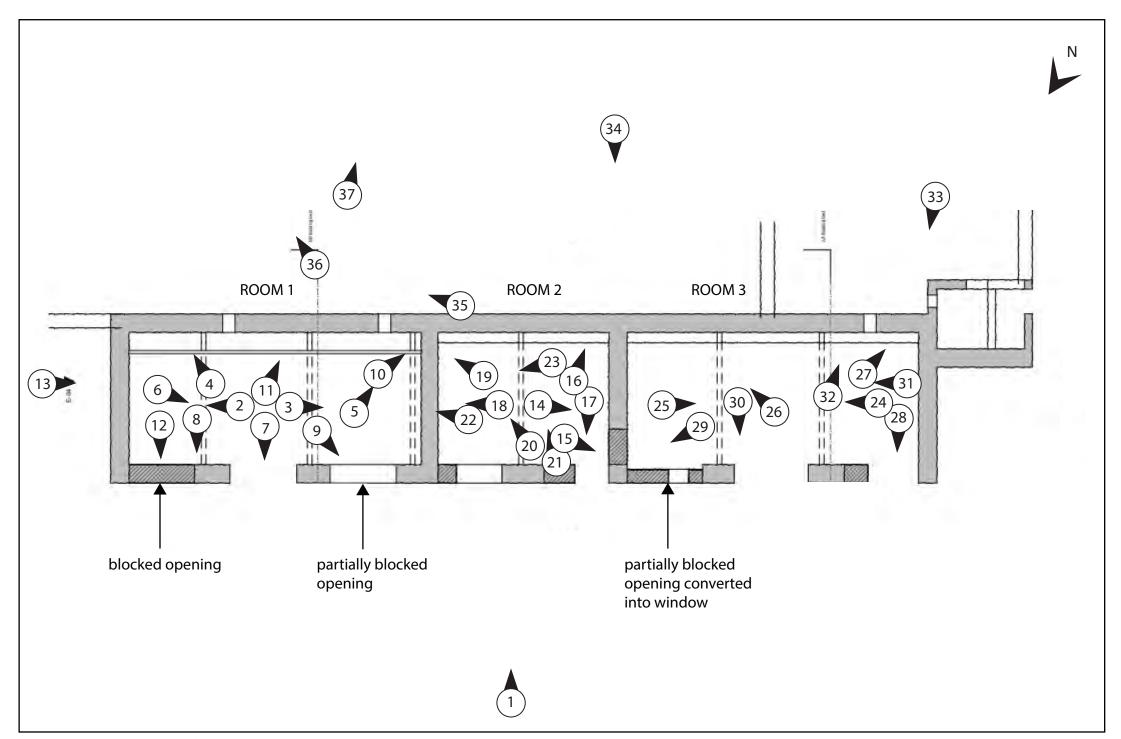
Reproduction of Brio Design + Architecture Existing Floor Plan with Gwynedd Archaeological Trust annotations showing the location and direction of photographic images taken. Not to scale.
